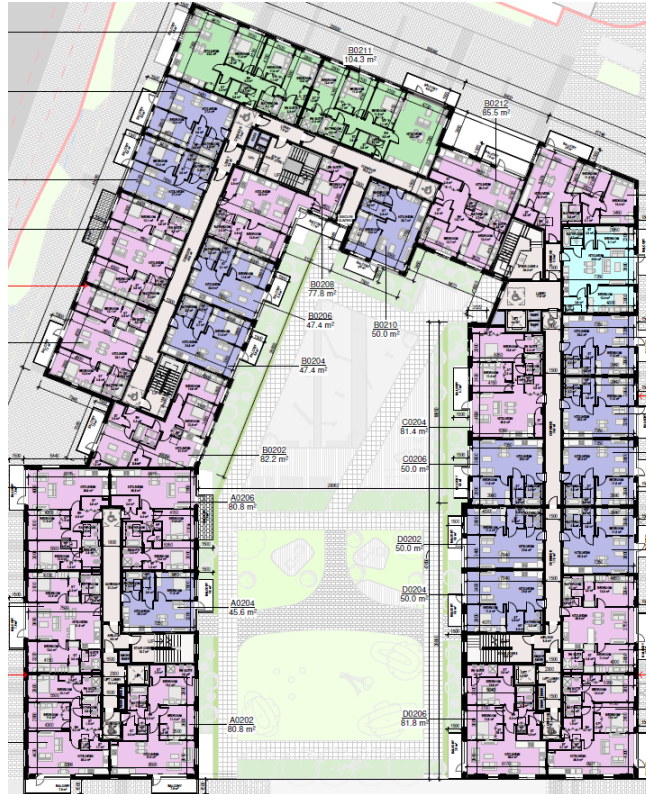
Second floor plan. We note the provision of 31 no. residential apartments (13 no. one-bedroom apartments, 16 no. two-bedroom apartments and 2 no. three-bedroom apartments) at this level.
